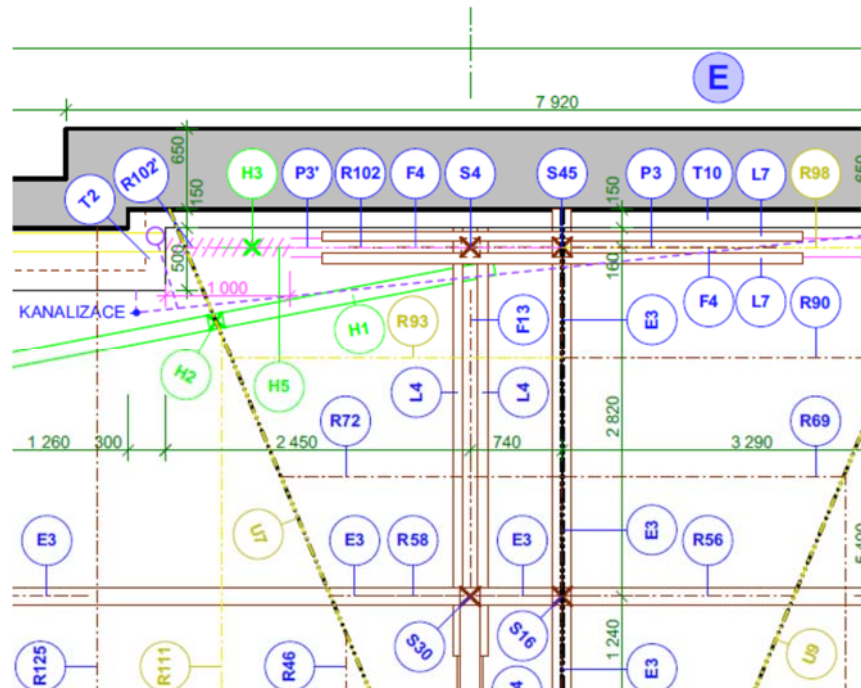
Floor plan with highlighted damaged elements of truss
